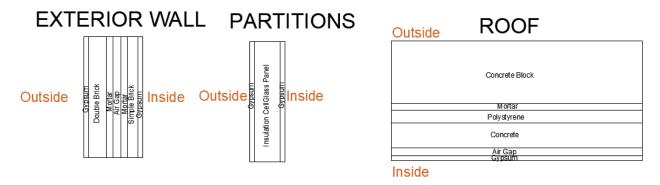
Construction layers for the roof, partitions and exterior wall. Source: Own
